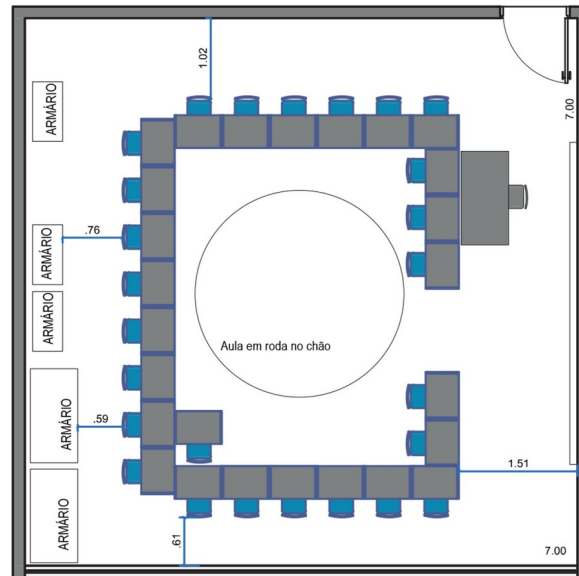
Plan of classroom with modified lay out by the teacher. (Status by author)
